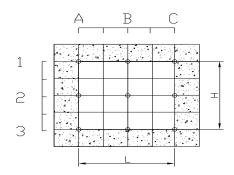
Schematic layout of measurement points in the Shaft VI diffuser cross-section [5]
